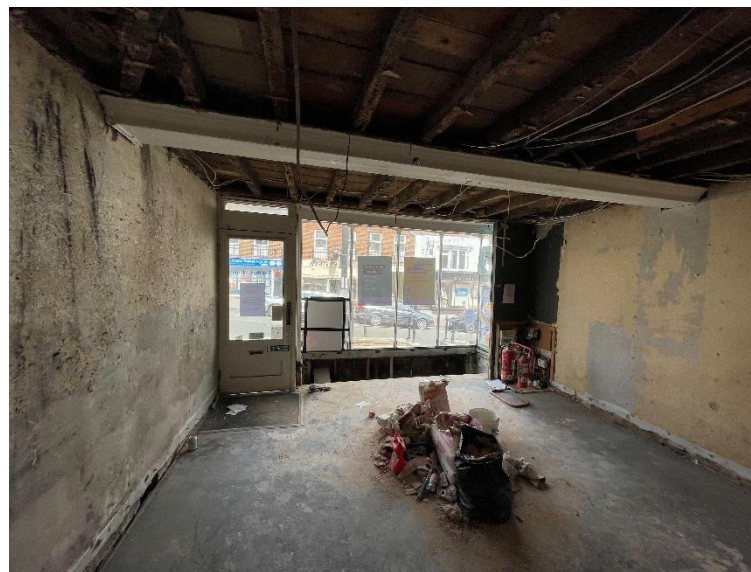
Front room, ground floor; decorative mouldings on beam still present.
